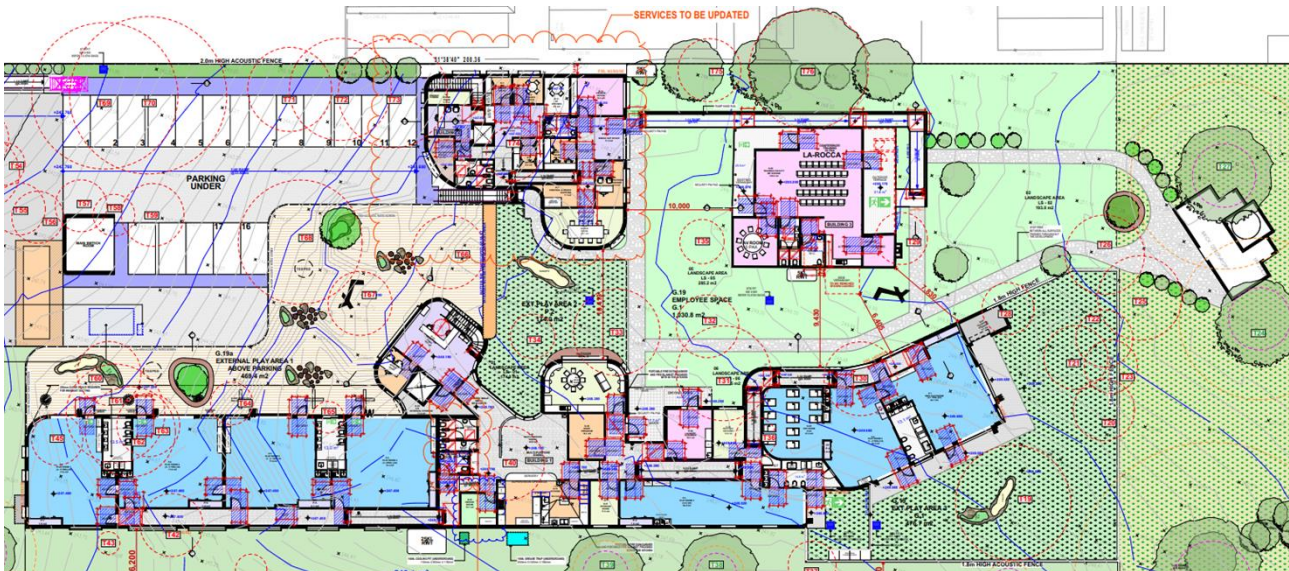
Proposed site plan – showing childcare buildings, and including restored La Rocca and Observatory
